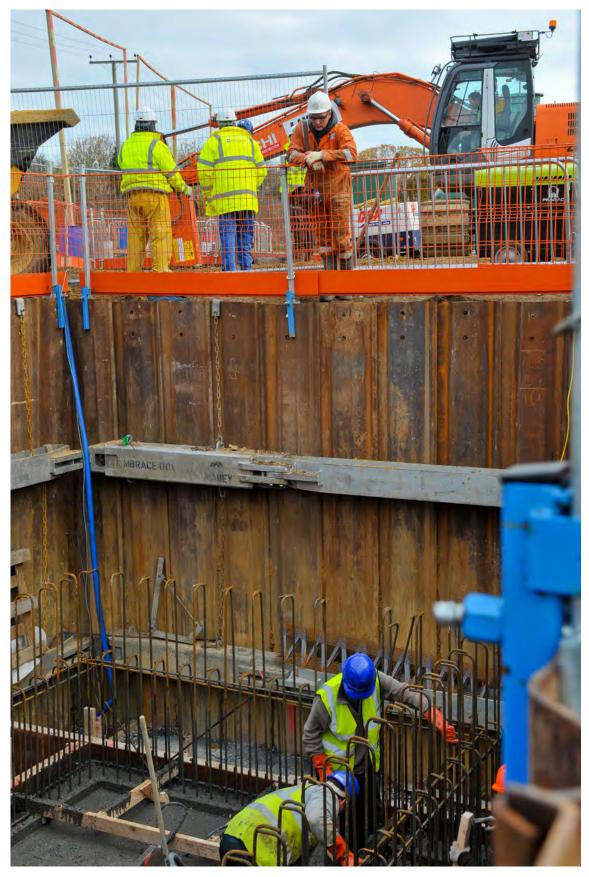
Excavation with Proprietary Bracing system and Edge Protection
